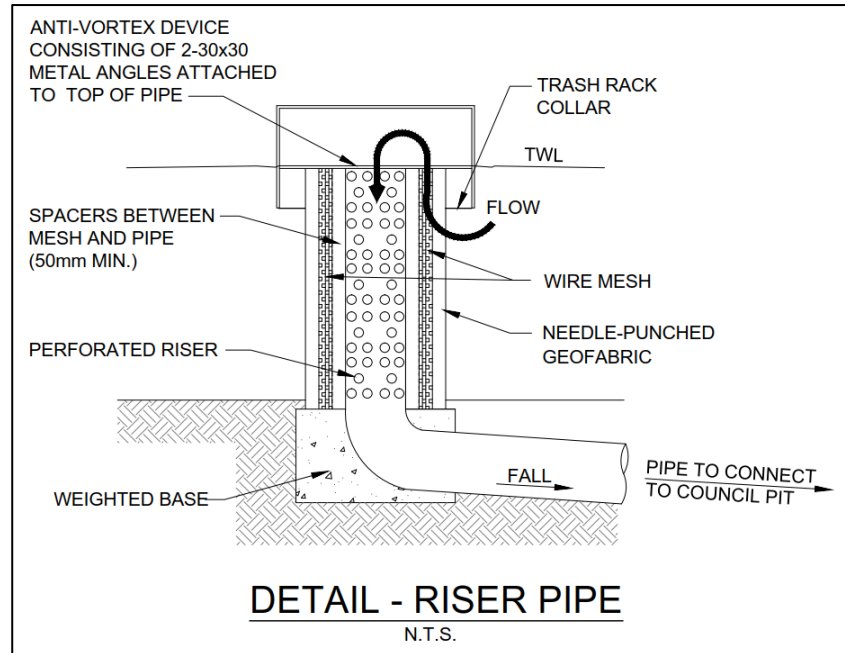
Pump Out Pit Outlet Pipe Detail
